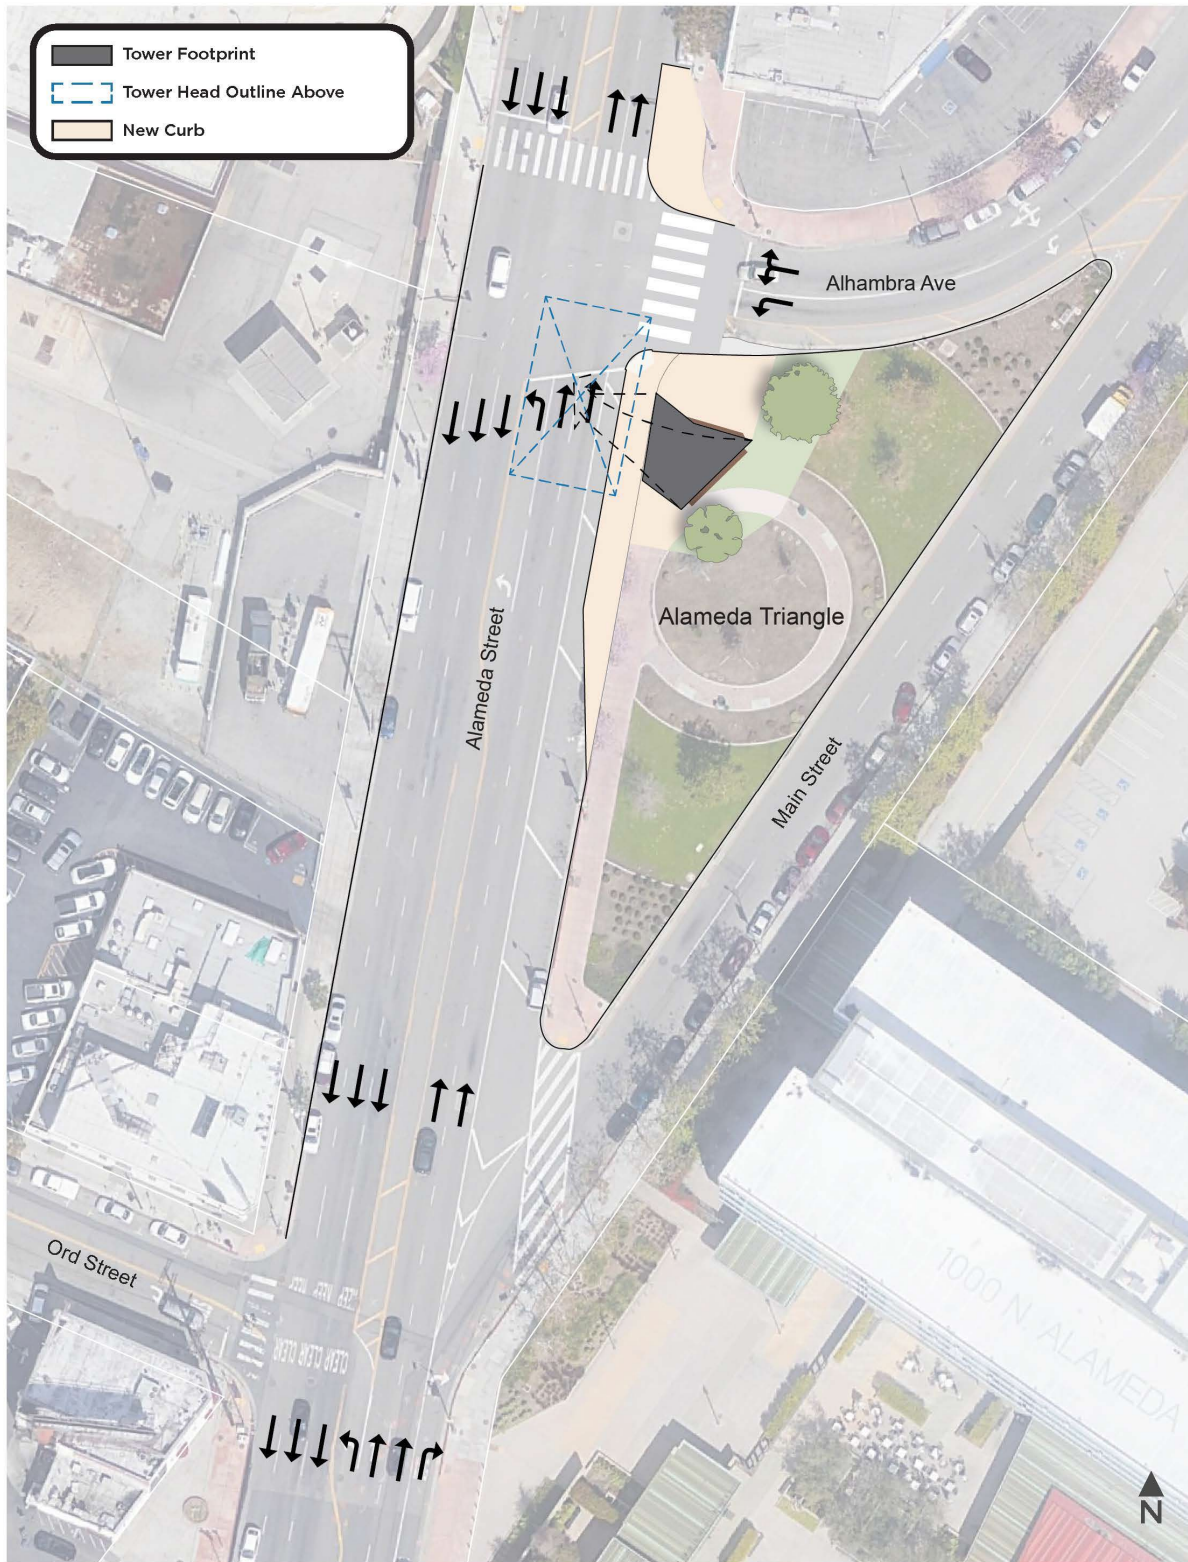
2-27: Alameda Tower Buildout Conditions
